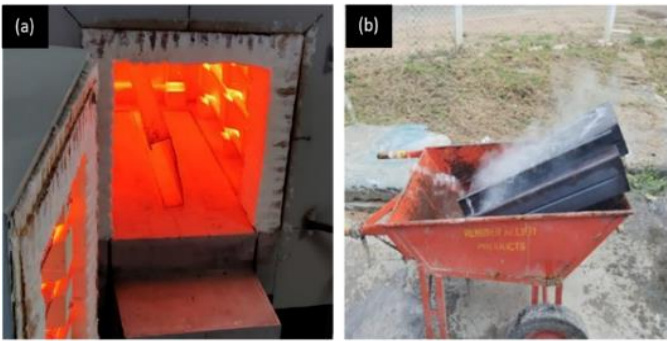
(a) Specimen exposed to elevated temperature using furnace (b) Specimen cooled by water cooling.
